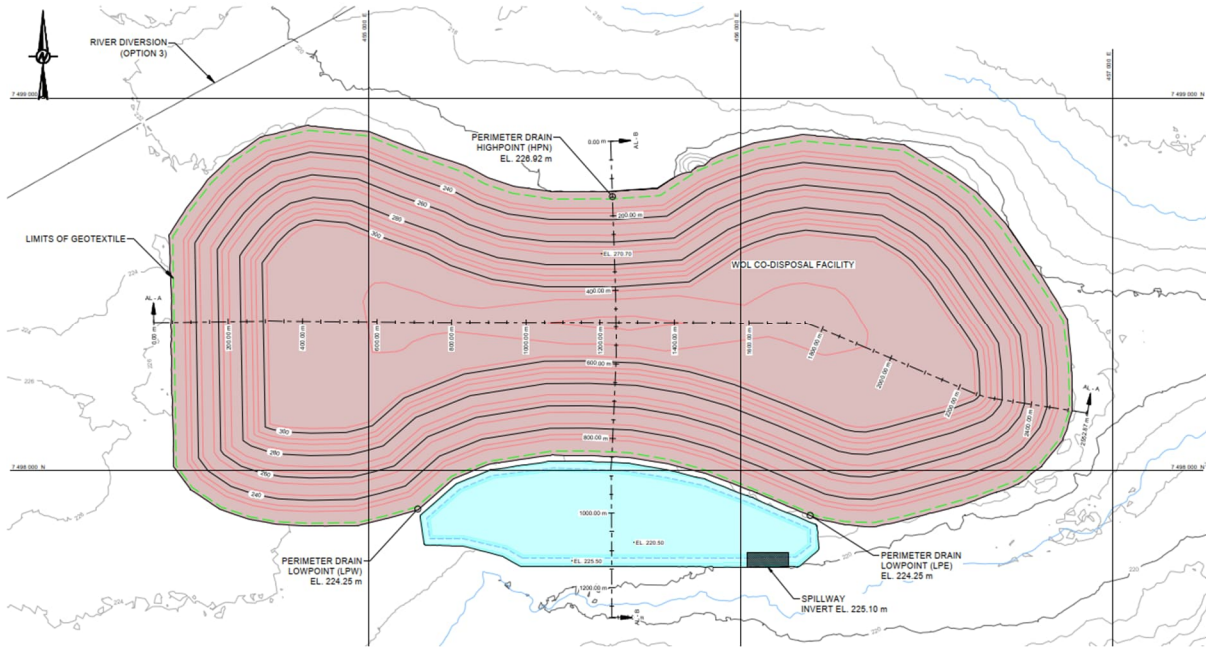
Developed Plan of WOL Co-Disposal Facility
